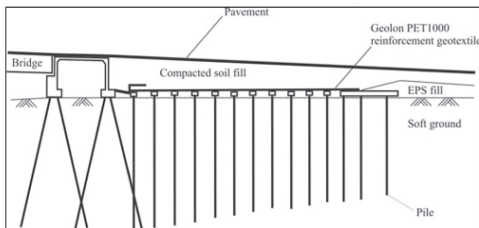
Longitudinal cross-section of bridge approach embankment at Wat Nakorn-In Project, contract EW1 (Yee 2005).
